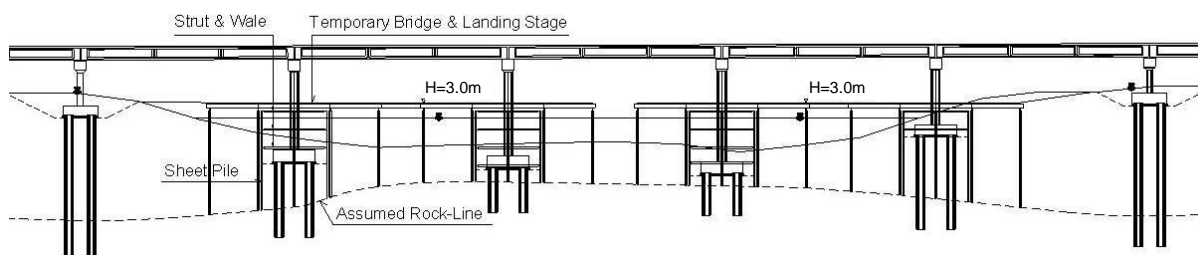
Temporary Bridge & Landing Stage Plan
